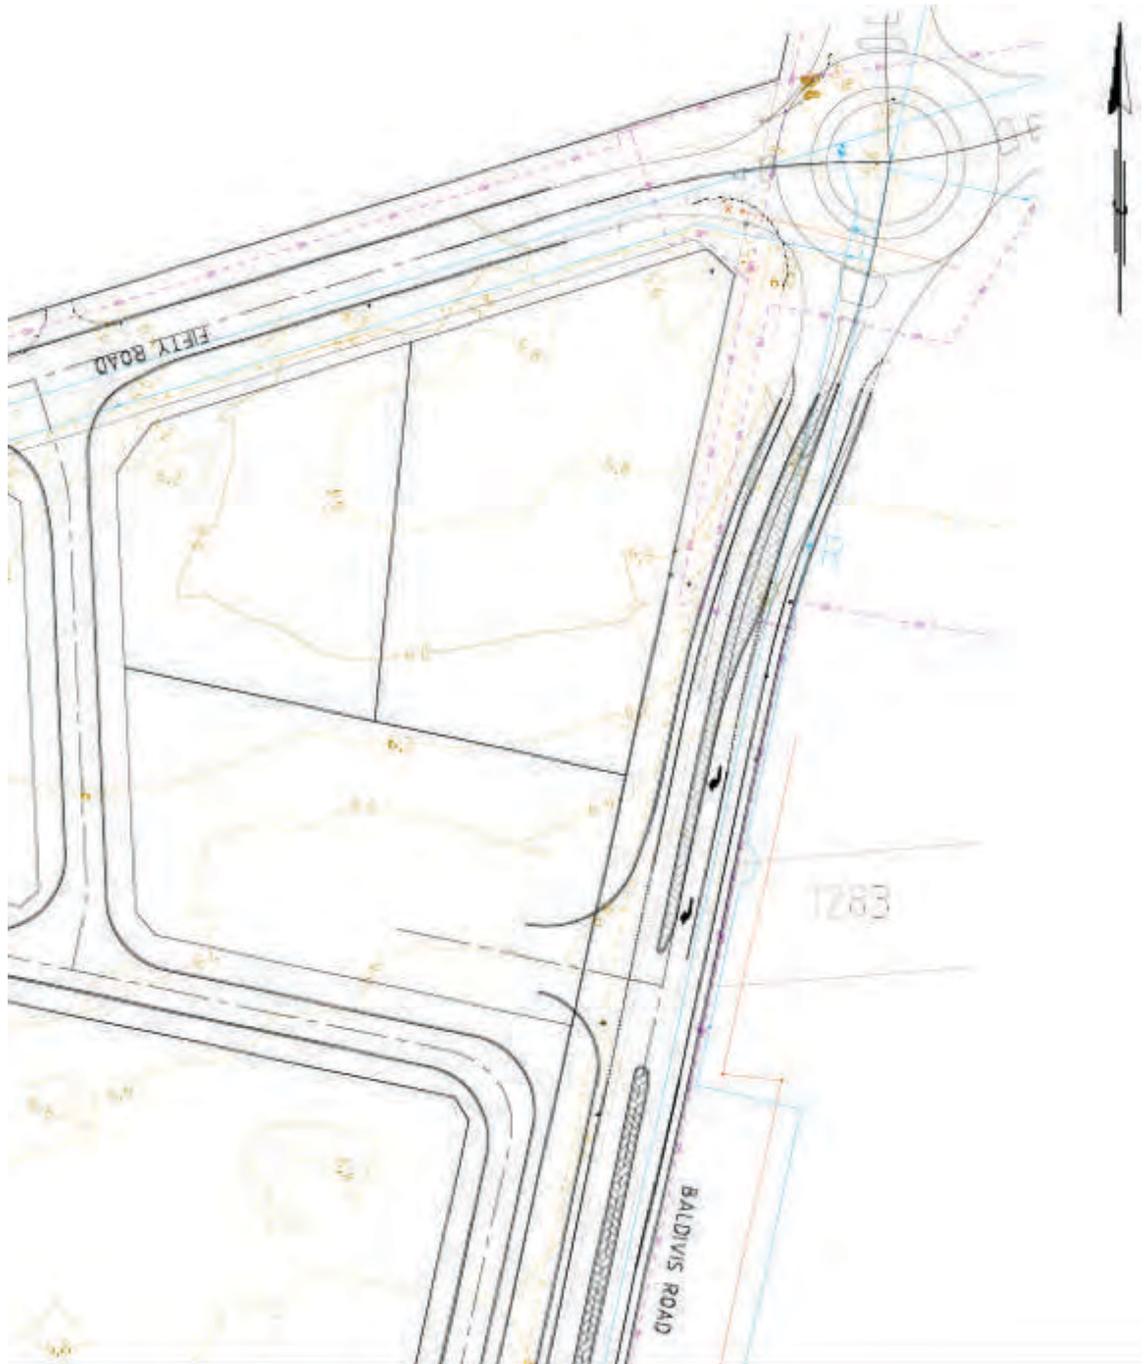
Developer upgrades to Balddivis Road to provide for adequate access/egress via Balddivis Road to special use site.
